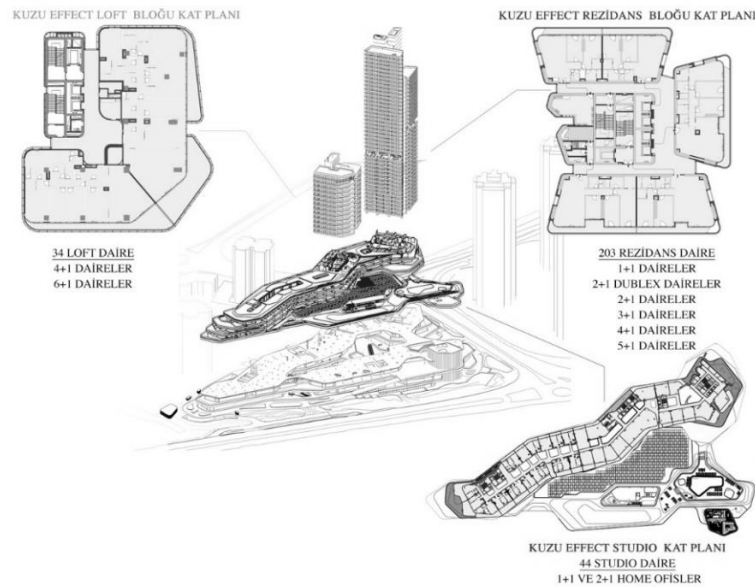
Kuzu Effect Blocks and Floor Plan
